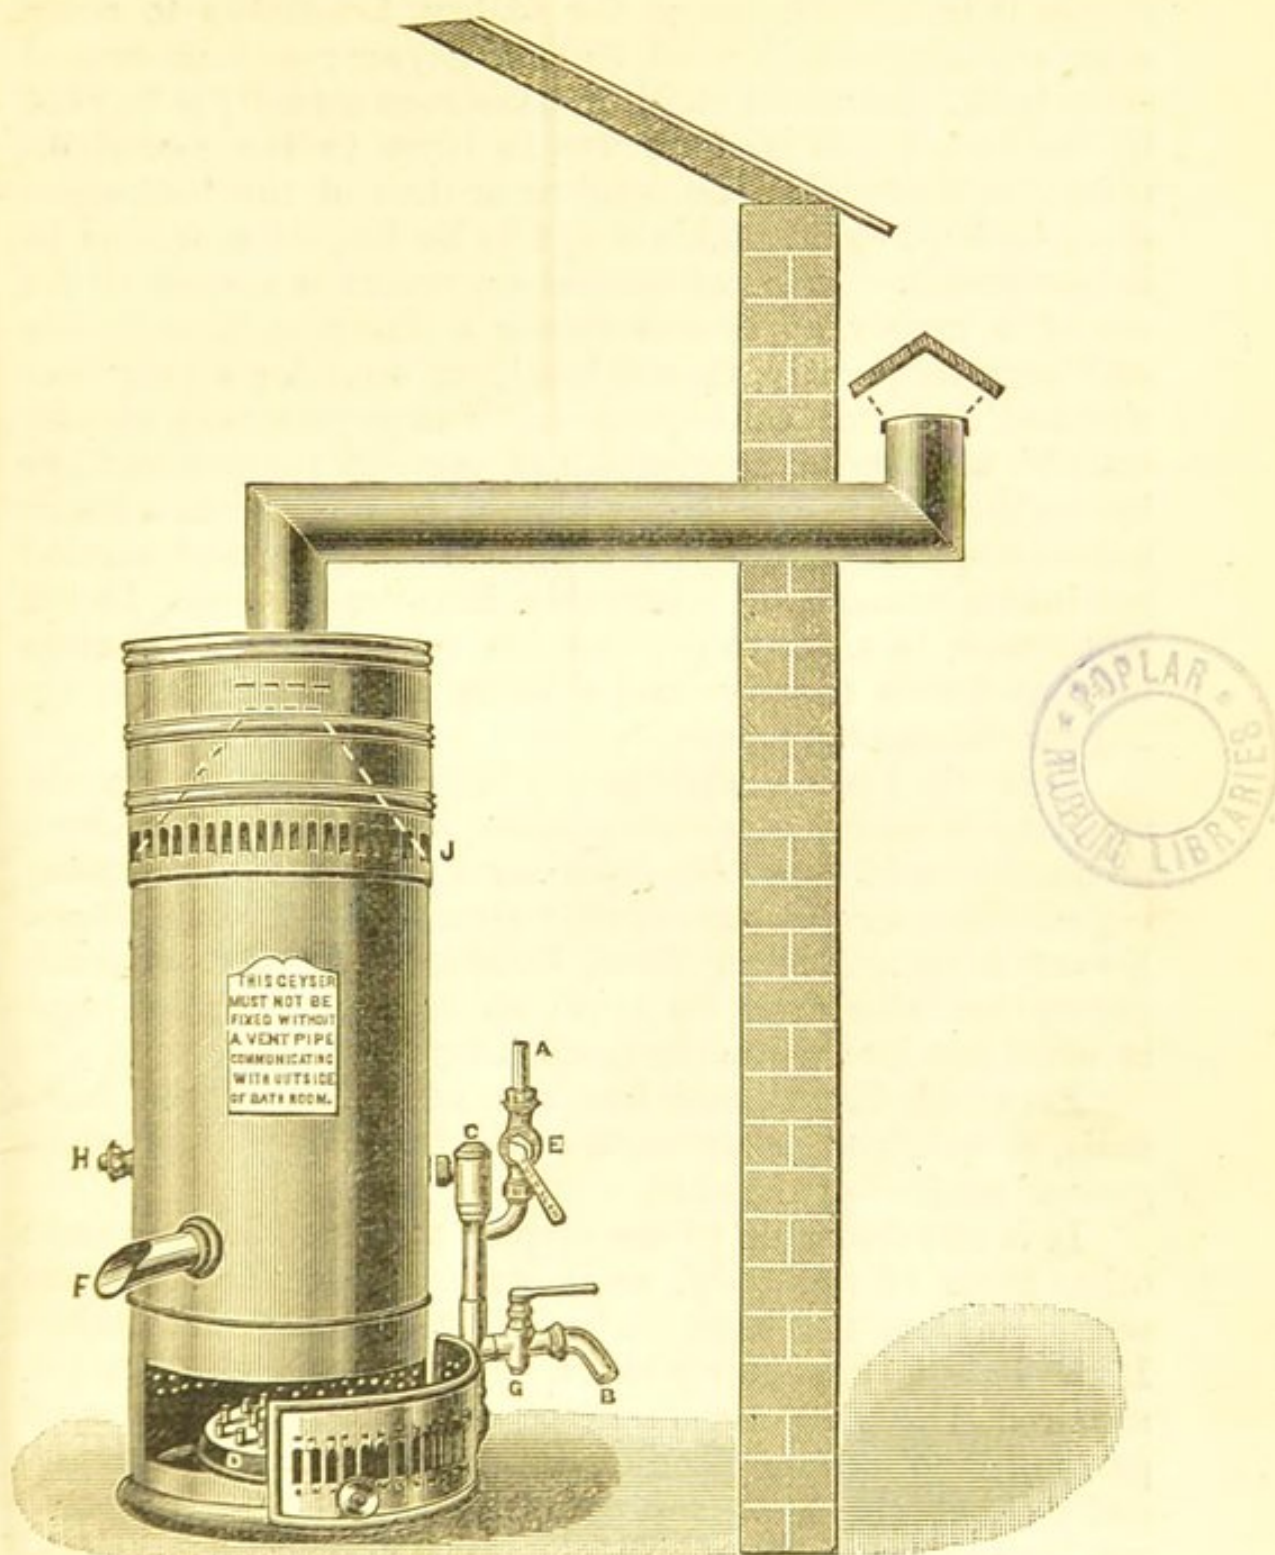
Geyser Apparatus with proper Ventilating Arrangements.
